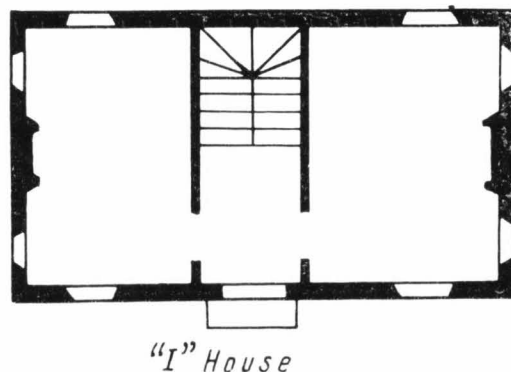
Floor plan of "I" house. (After Richard Francaviglia, *Mormon Central-Hall Houses*, 1971)
